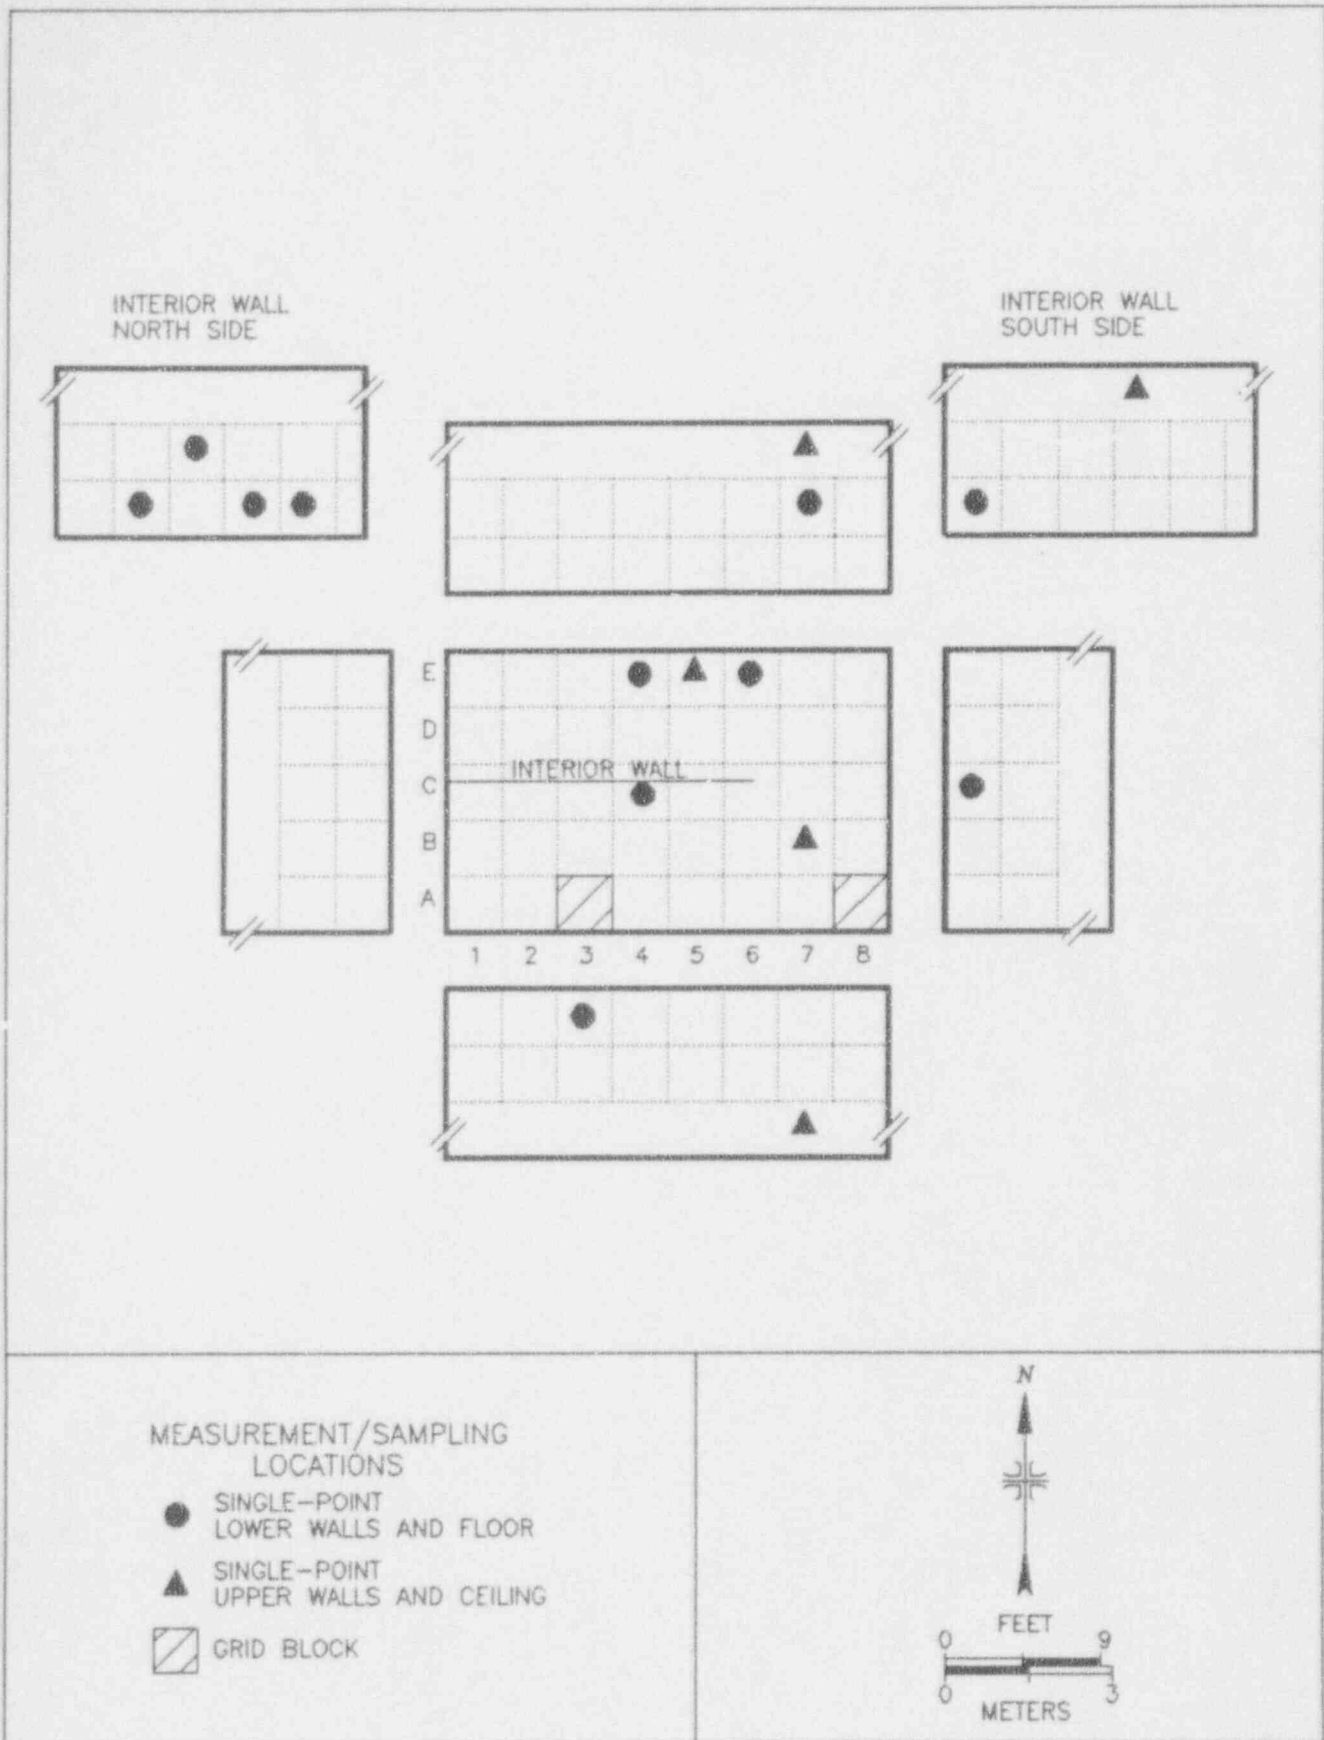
Plutonium Facility, Room 14 - Measurement and Sampling Locations
